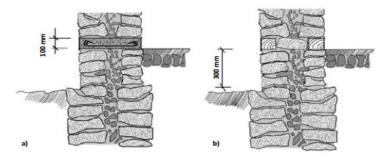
Stone masonry foundation with plinth bands: a) RC band, and b) timber band
